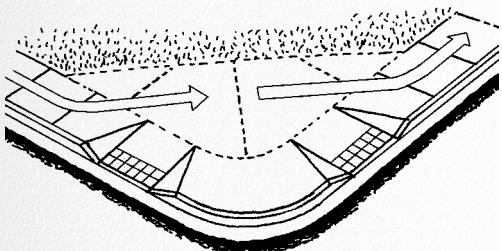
Additional right-of-ways to widen sidewalks can be obtained either through purchase, an easement, or donation of fee title.
